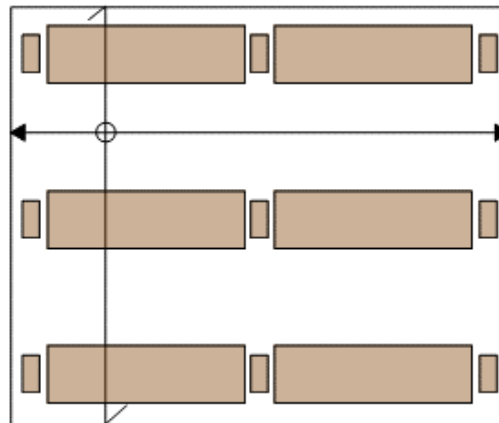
Post and slab band concept plan view (courtesy of Aspect Structural Engineers).
